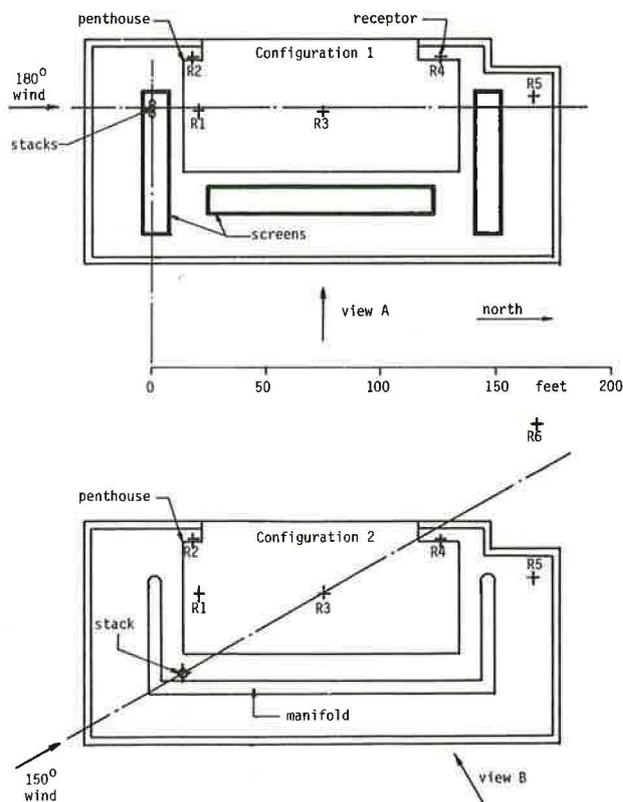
Plan views of the Petersen-Wilson laboratory building in Configurations 1 and 2
